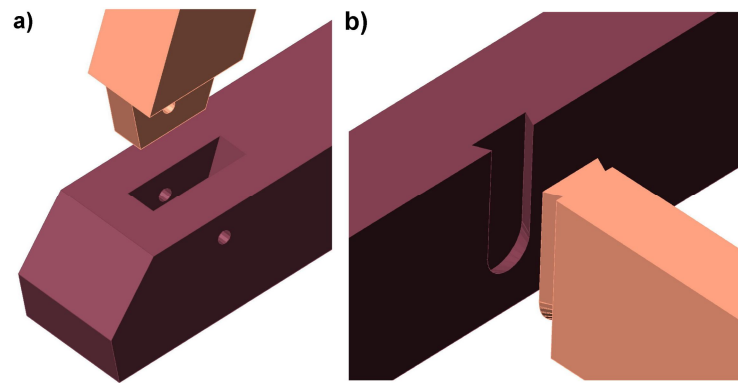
a) Traditional rafter-tie beam connection, b) modern dovetail (tenon) joint as secondary beam – main beam connection
